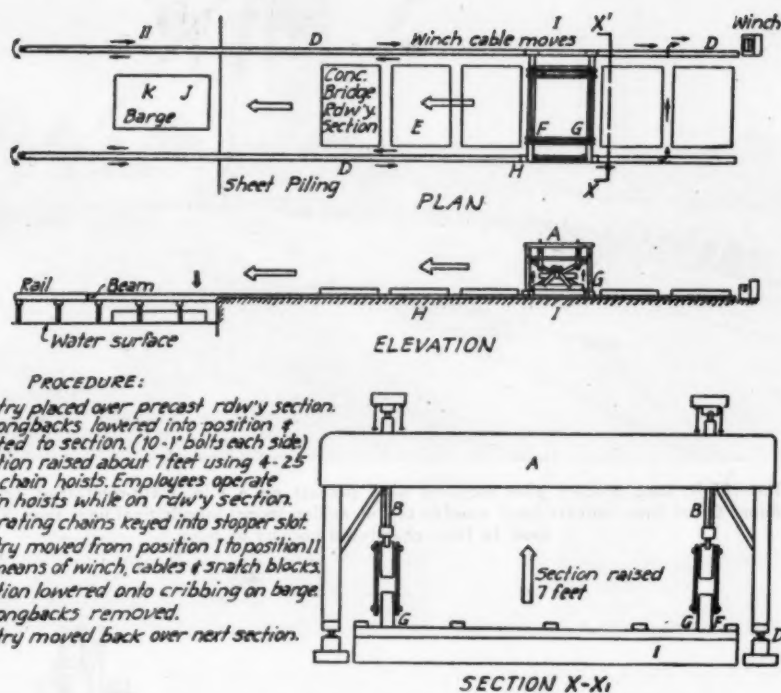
Layout drawing for casting yard used by Diamond Construction Co. in submitting an accident control analysis to its insurance company
